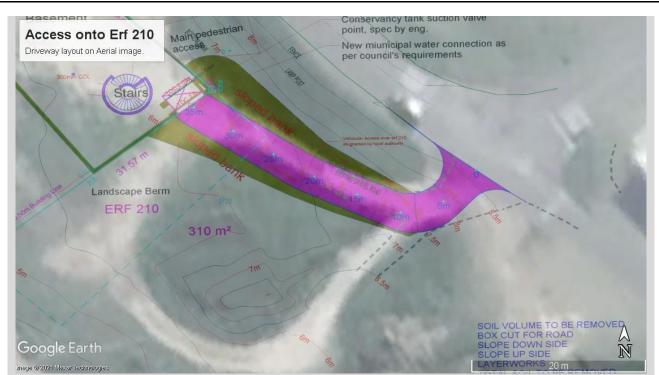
Access driveway & vehicle ramp excavation layout overlay onto Aerial image.
